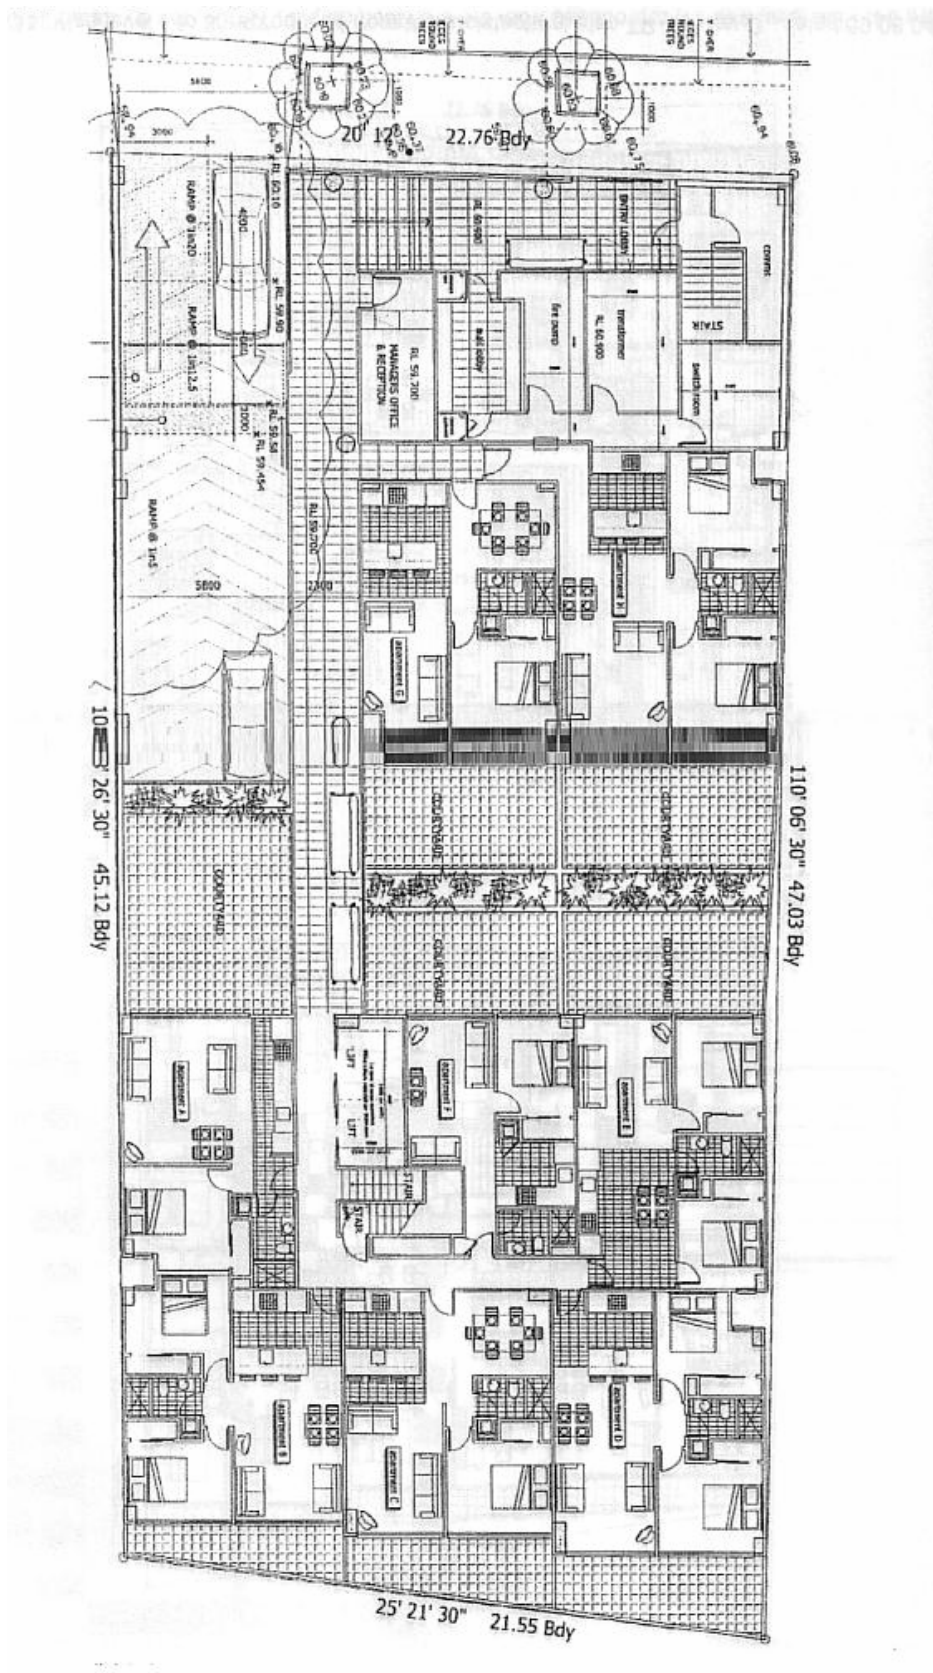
Plan Level Ground, reproduced from the architectural plan TP_02 , rev G, dated 09.08.04
